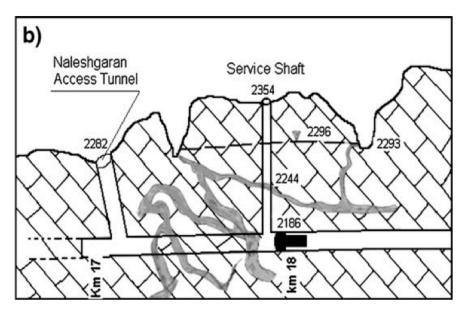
a) Schematic plan of the karstic zone in km 17+705 -17+814, b) Profile of the Kuhrang Tunnel in karstic zone in km 17+705-17+814 (Sharifzadeh et al., 2012).
